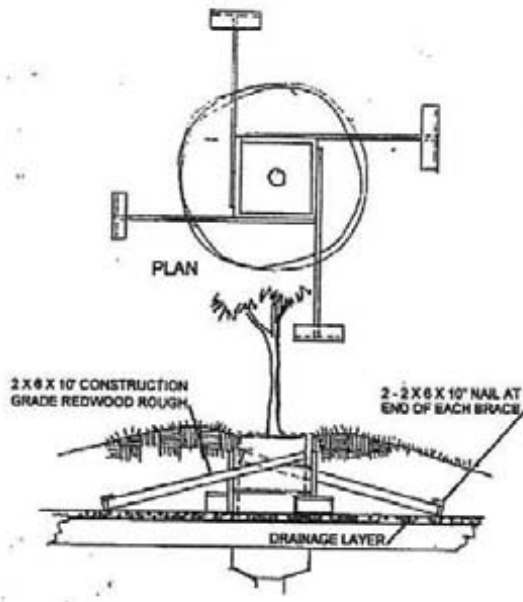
MATURE PALMS PLANTED OVER STRUCTURE IN LOS ANGELES & DETAIL
